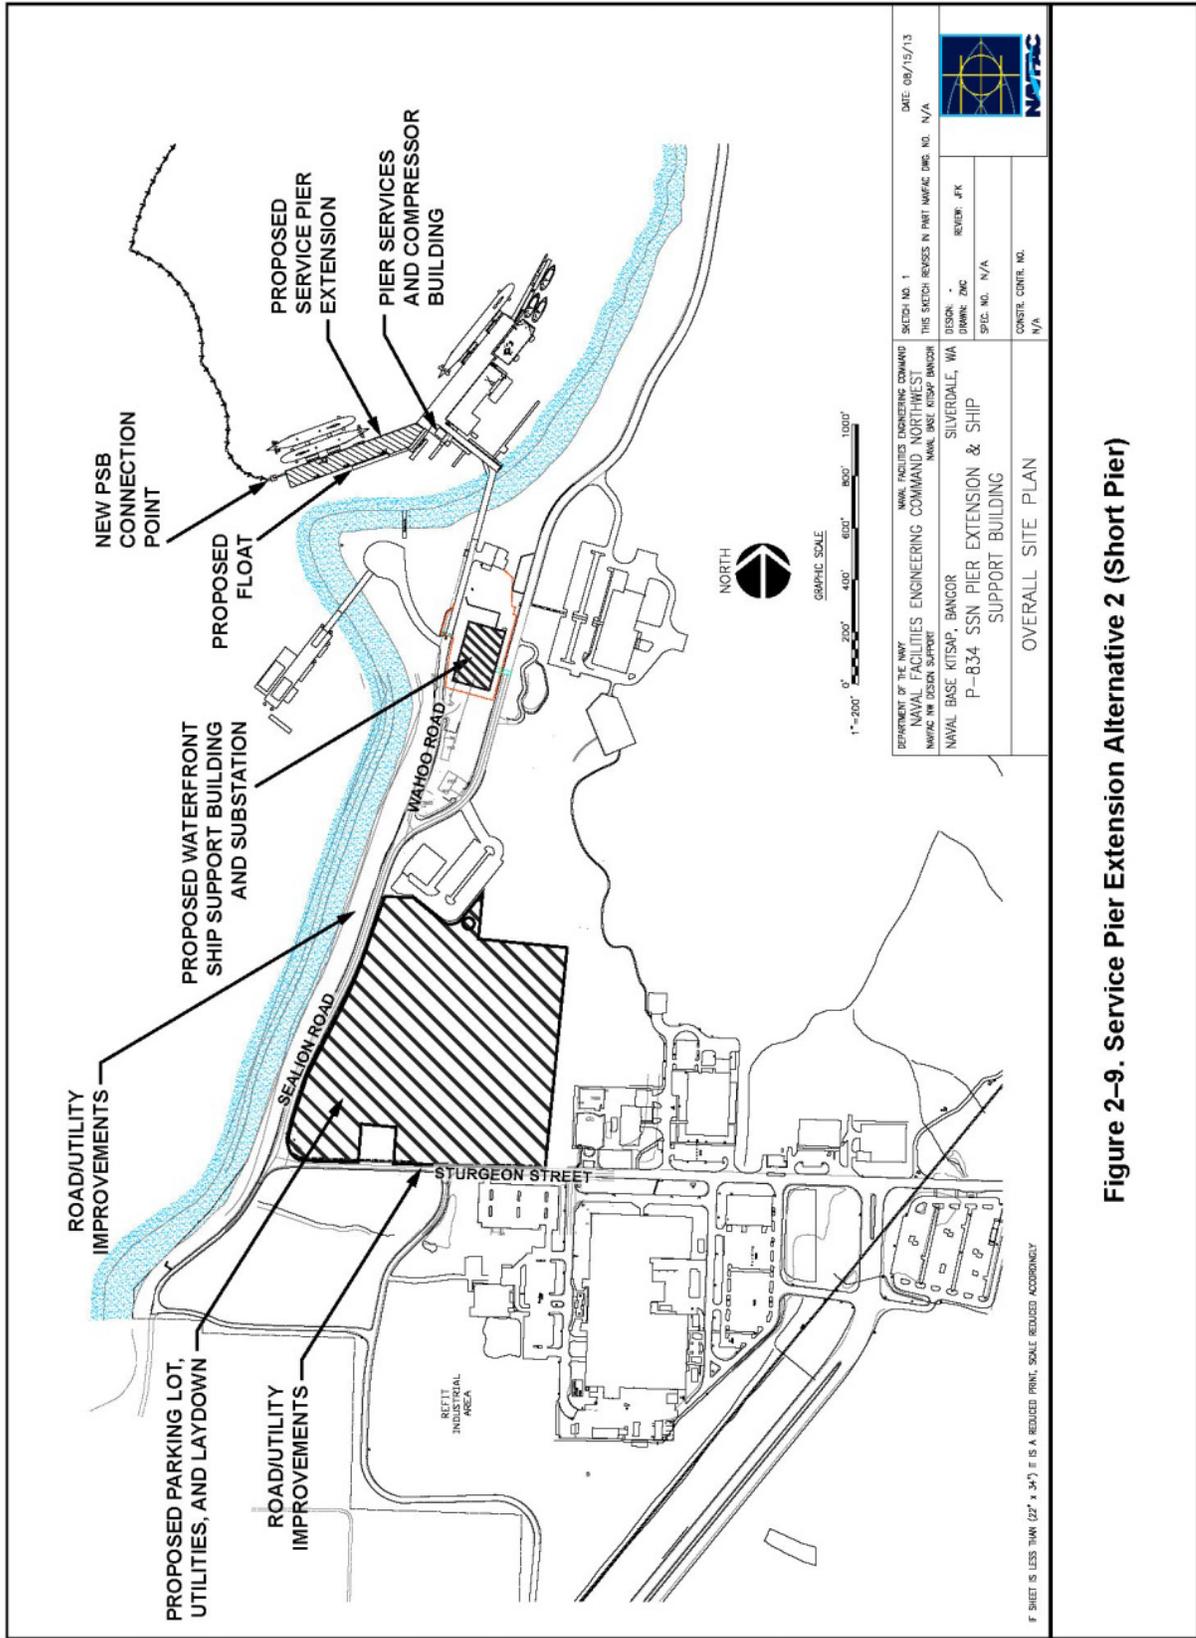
Service Pier Extension Alternative 2 (Short Pier)
